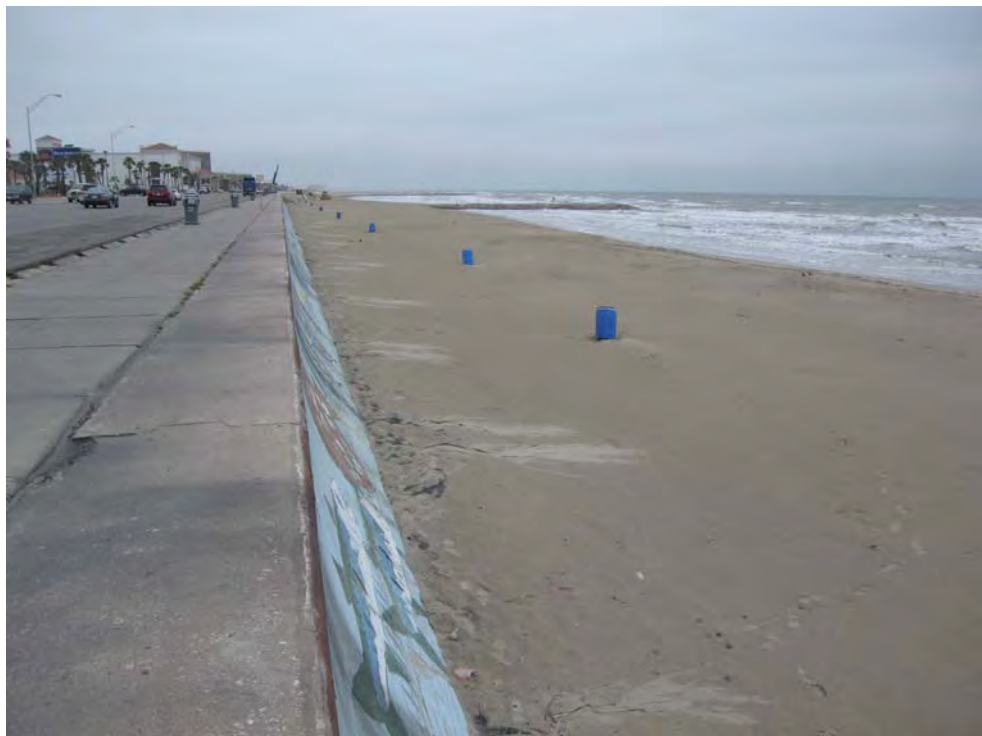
Post-Construction Photograph Facing East (provided by the GLO)
